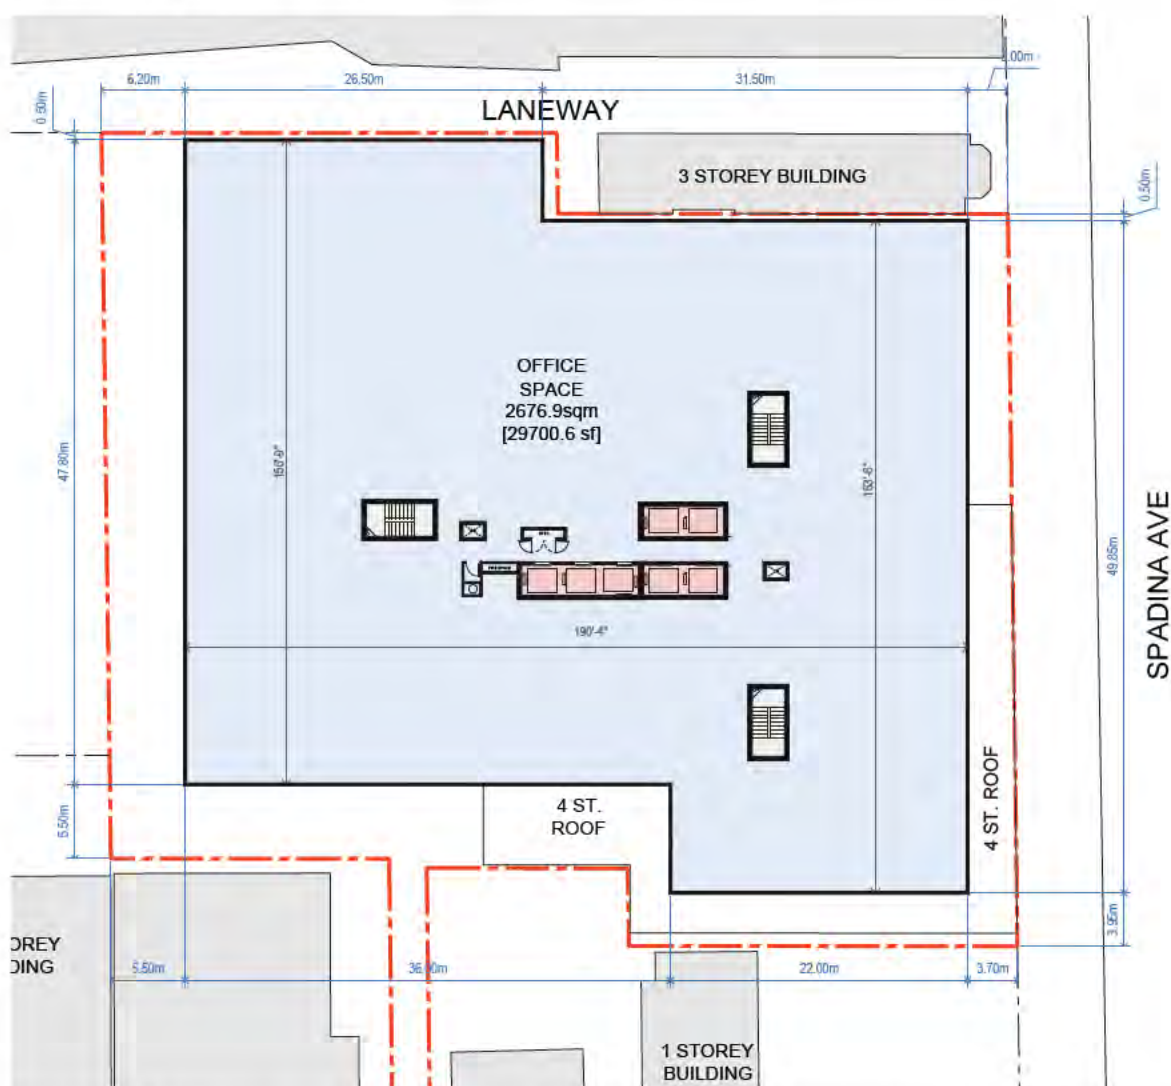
Preliminary proposed fourth floor plan dated March 2022 showing proposed stepbacks of tower from east elevation (Wallman Architects, 2022).
